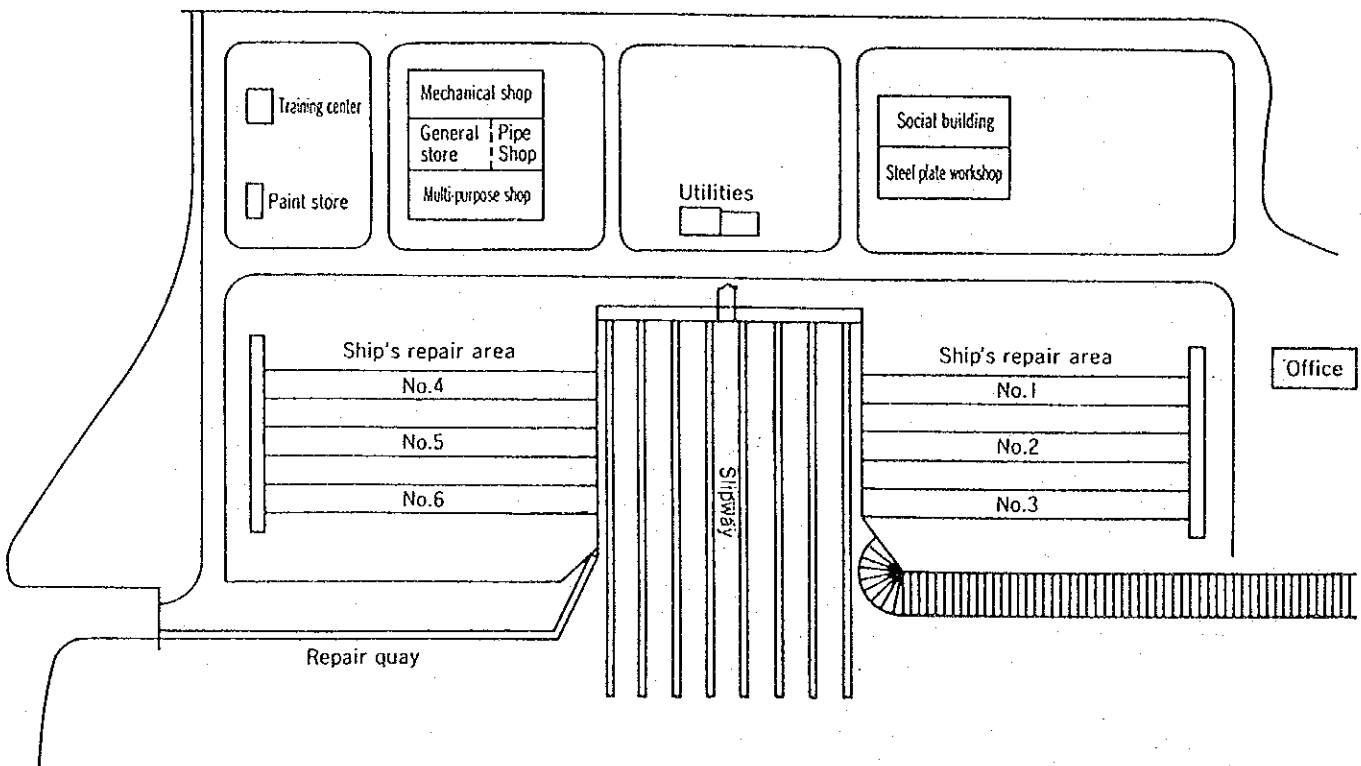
CABNAVE Dockyard site layout plan
